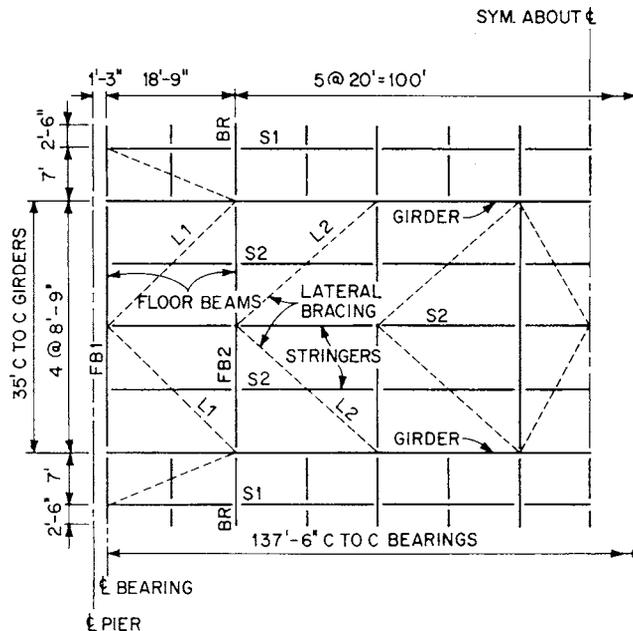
Framing plan for four-lane highway bridge with deck plate girders.
